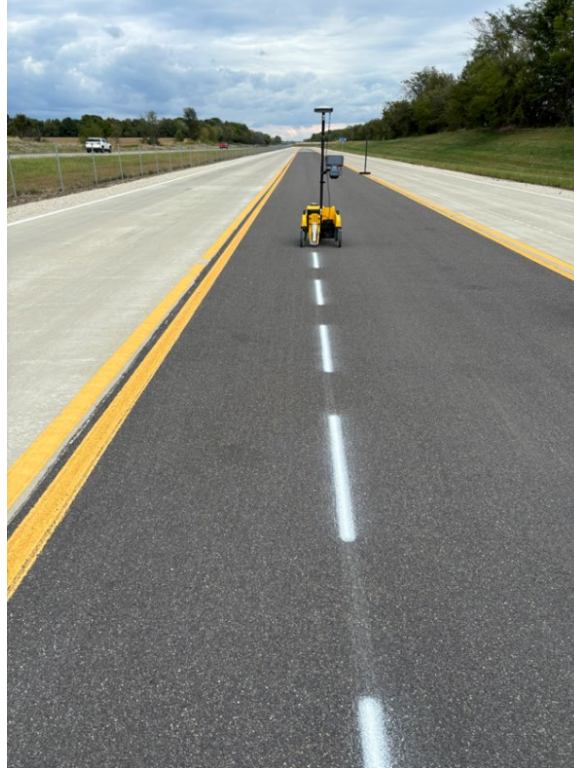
Photo. Painting robot used to mark a guide 7 in. right of the left wheel track.
